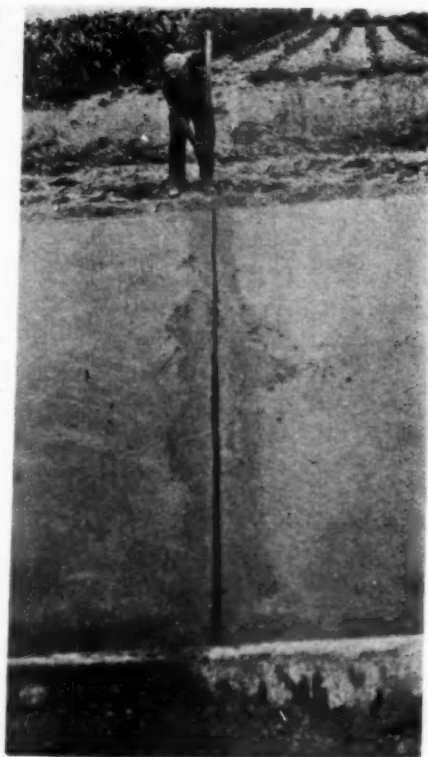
Joint Immediately After Removal of Metal Strips and Before Hand Finishing
